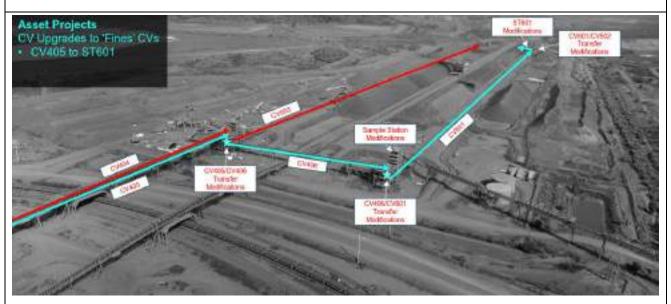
Ore Handling Plant 4 Fines Conveyor Upgrades
